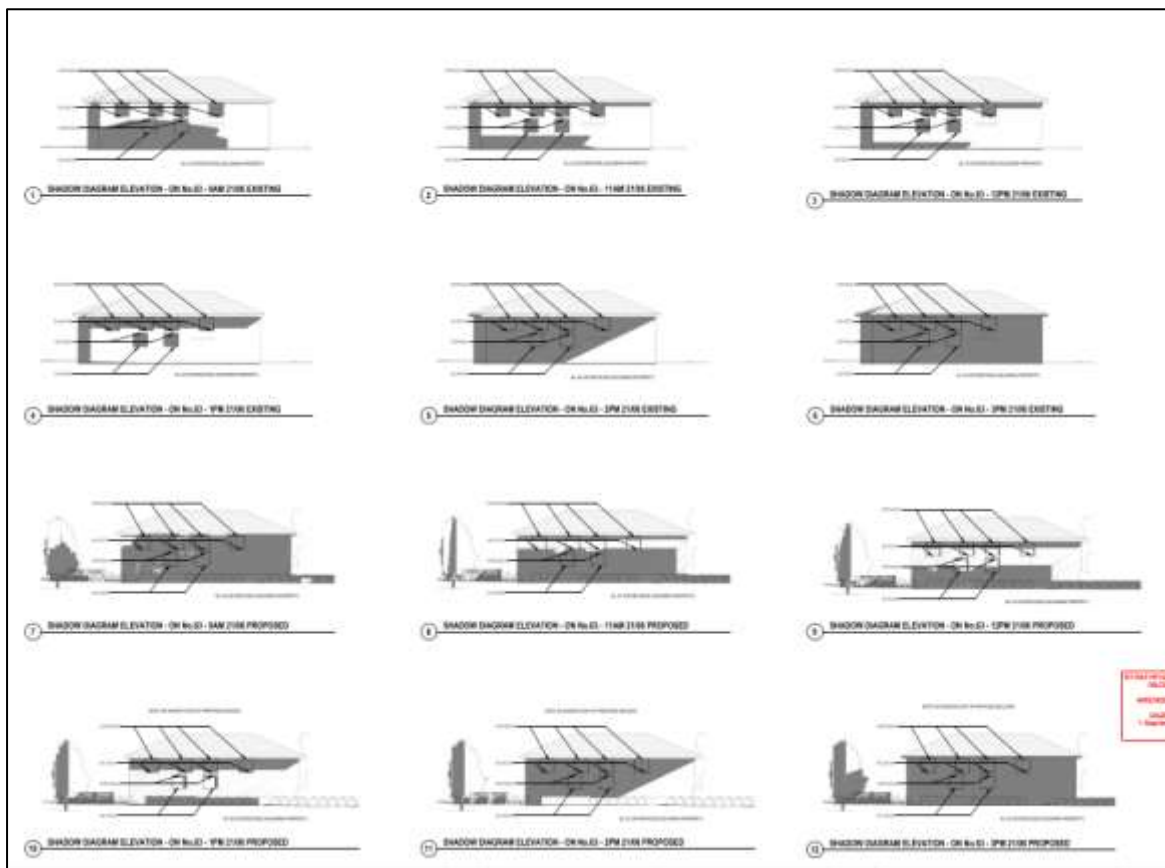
Shadow on elevation plans of adjoining dwelling at 63 Oxford Road, Strathfield.
